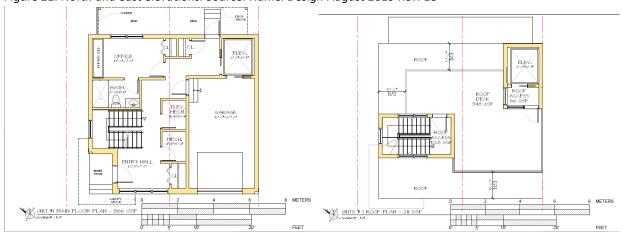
Ground floor and roof plan of Unit 1. Source: Hamel Design & Planning Rev. 19 August, 2019.
